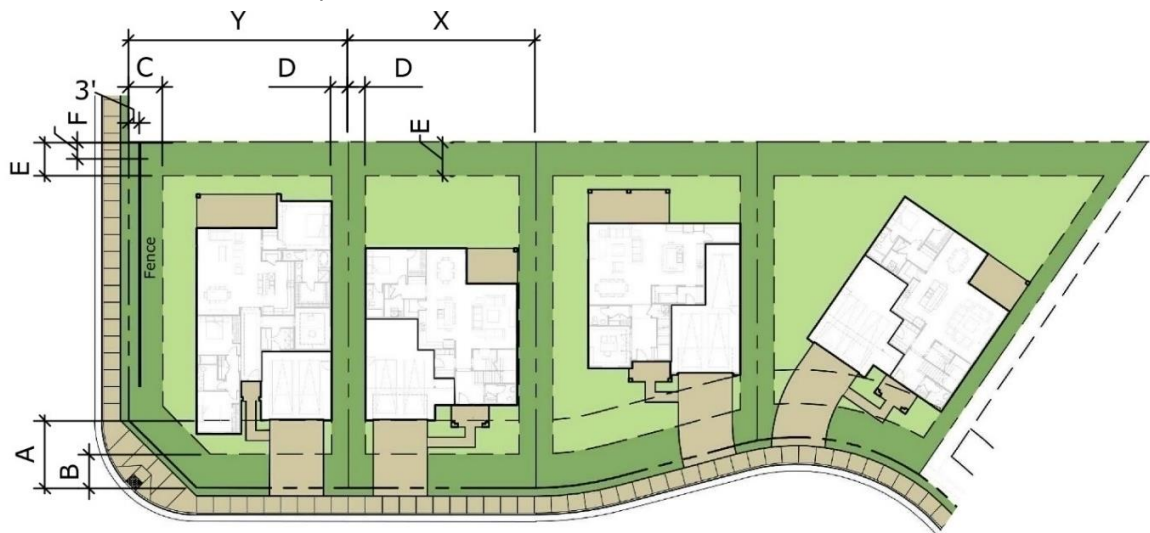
Lot Configuration and Setbacks Plan
